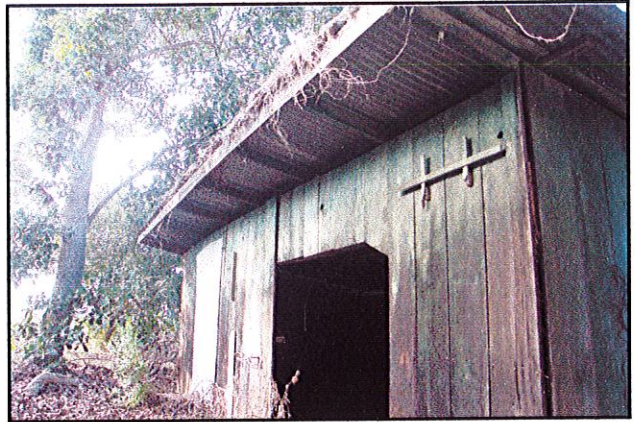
Utility building, built ca. 1925–1930. This view is facing northwest, toward the south (primary) elevation. Photograph date, November 5, 2002.
